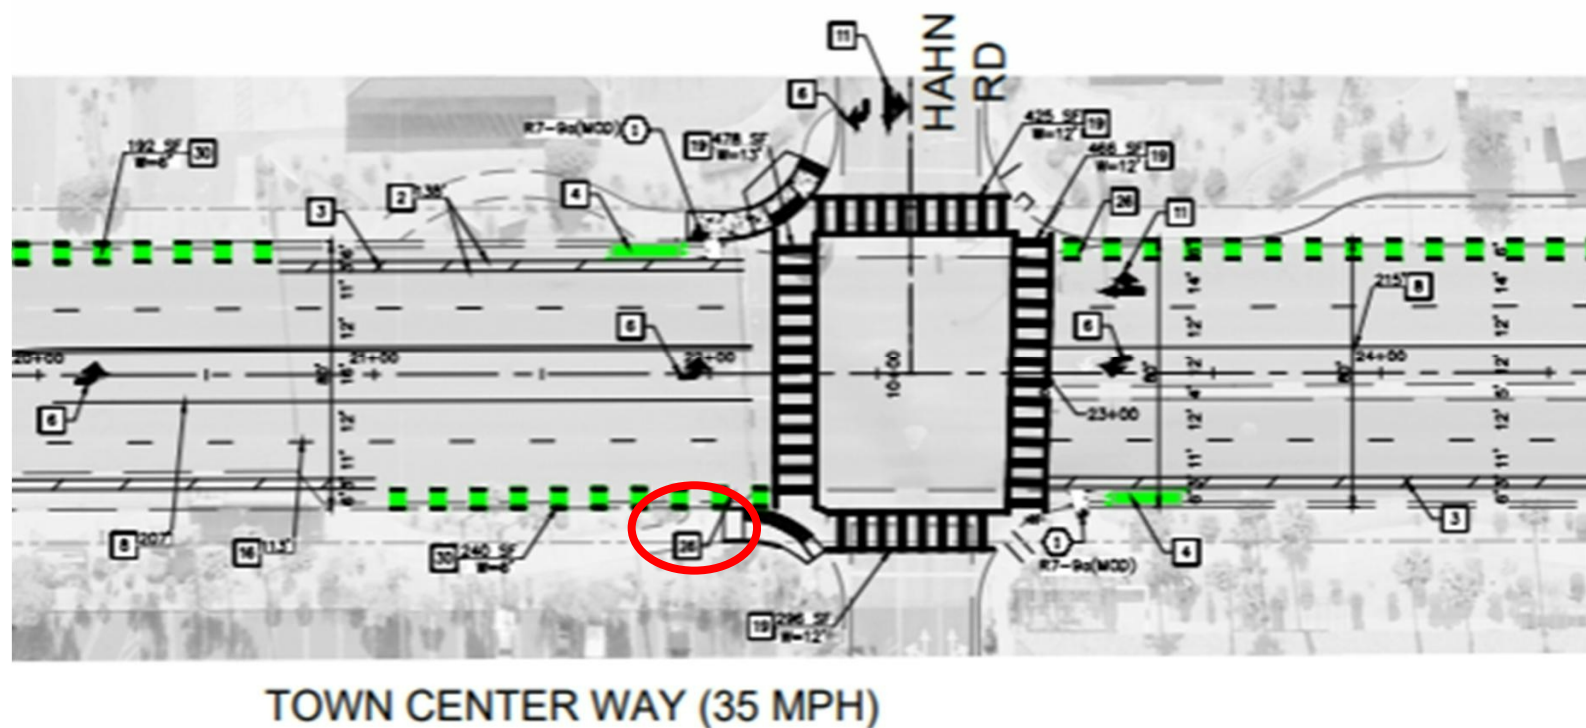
Hahn Rd/Town Center Way N/W Ramp redesign.
